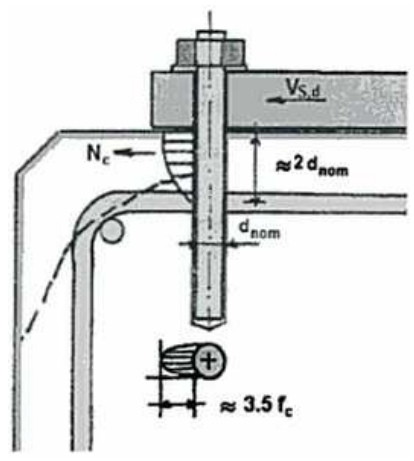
Local failure of concrete in front of anchor bar adopted by Randl et al. (2001)
